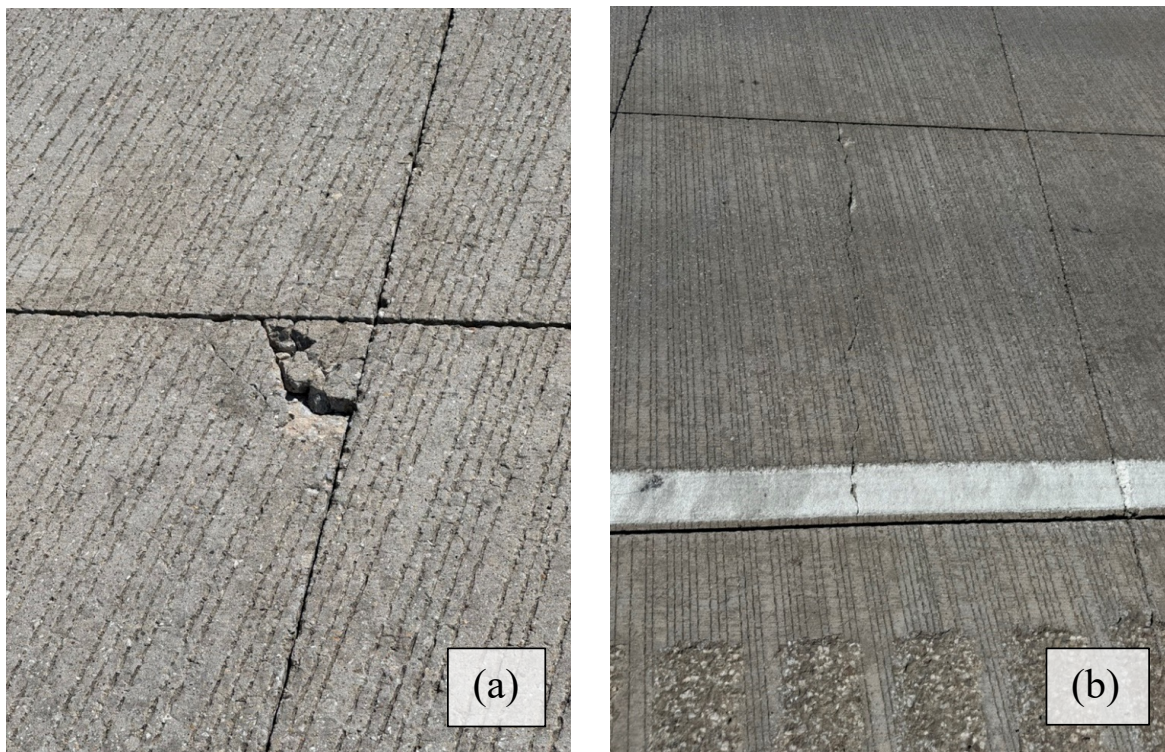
Photo. (a) Typical corner spall in I-72 WB and (b) transverse crack across full-width panel.
